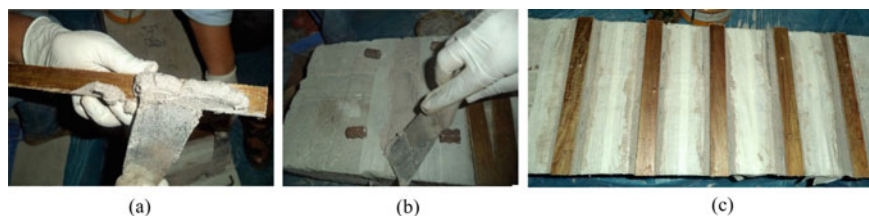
a Epoxy adding on the JFRP, b fixing double connector, c fixing JFRP plates with epoxy
